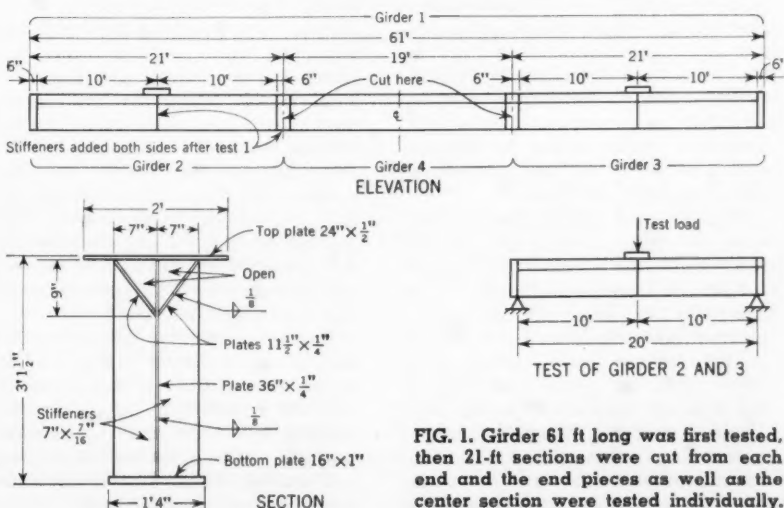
Girder 61 ft long was first tested, then 21-ft sections were cut from each end and the end pieces as well as the center section were tested individually.
